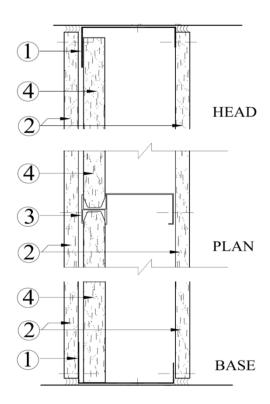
Two Hour Cavity Stair Wall (Non-Load Bearing)
